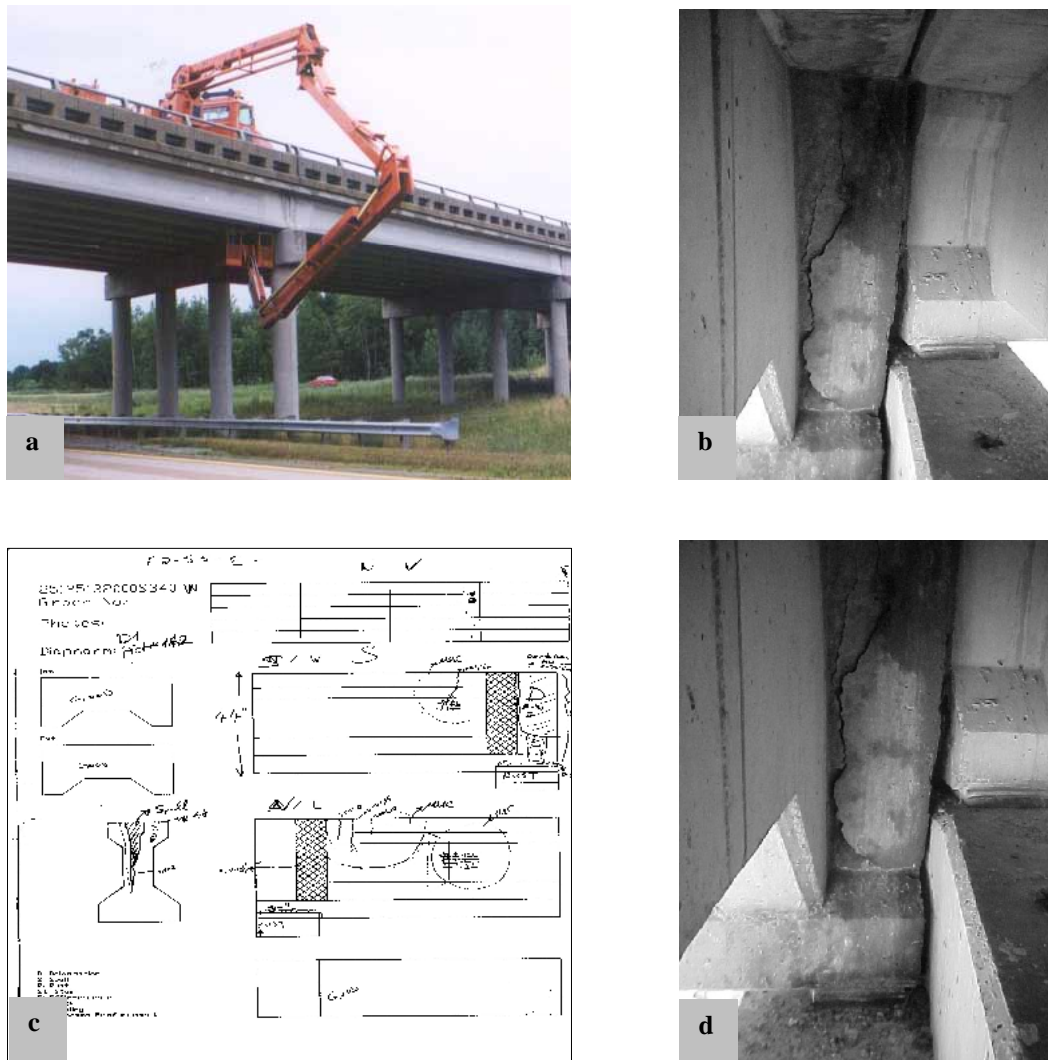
(a) General view of the bridge (ID 25132 S340); (b) Condition of beam-ends of adjoining spans with deck; (c) Field inspection form depicting the beam-end condition; (d) Beam-ends with bearings.
